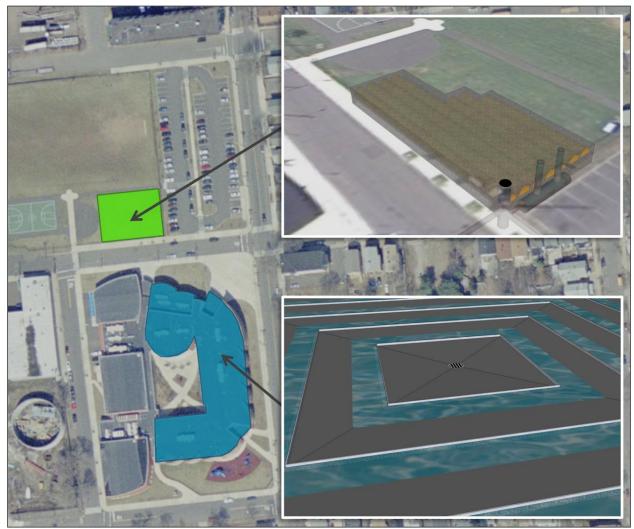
Subsurface rainwater harvesting storage (top) and blue roof check dam system (bottom)
